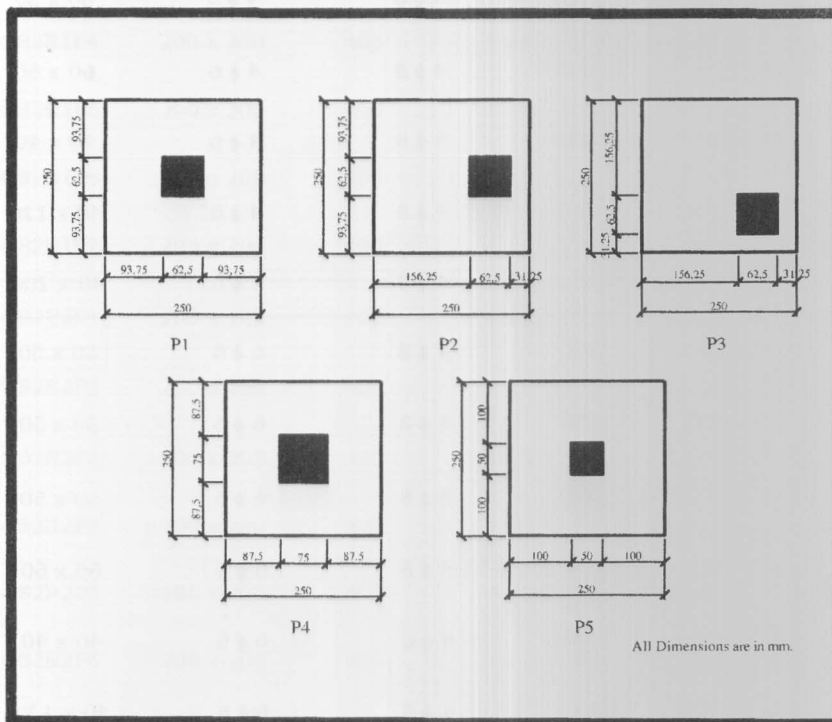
Loading patterns for tested high strength concrete blocks group GS3.
